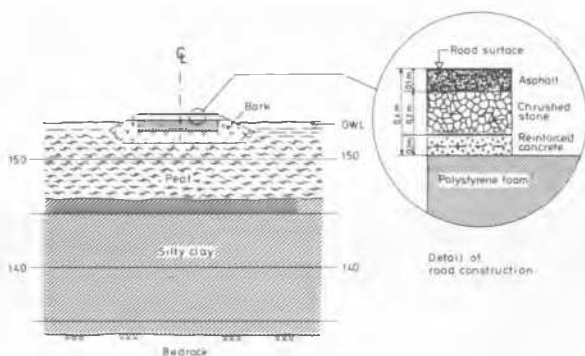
Cross-section profile of road embankment, Solbotmoan
